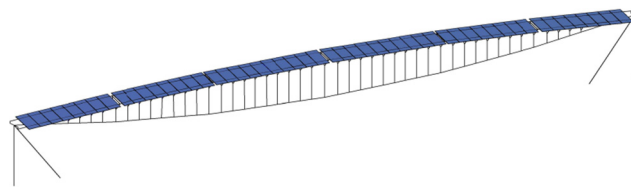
Visualization of 63 m span cable truss flexible photovoltaic support structure.
